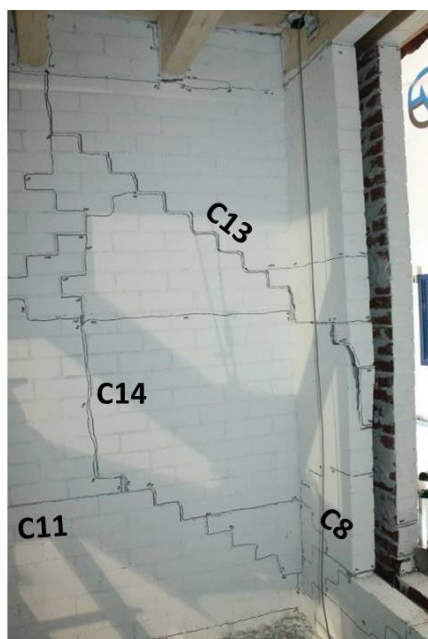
EQ-NPR 100% cracks – North clay façade.
